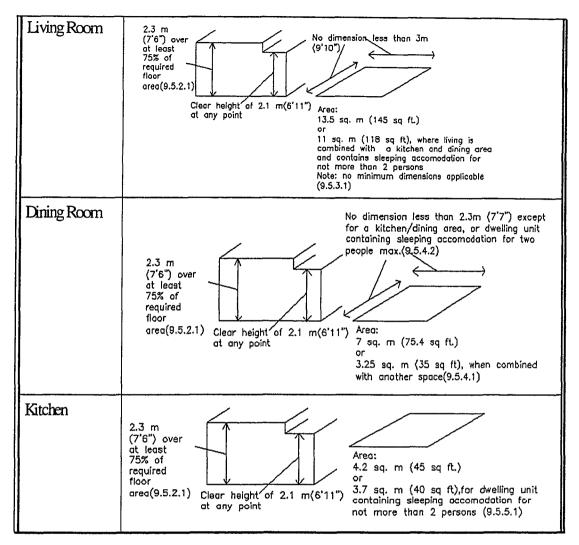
Room Minimum Requirements: Height, Space and Dimensions (1/3)
